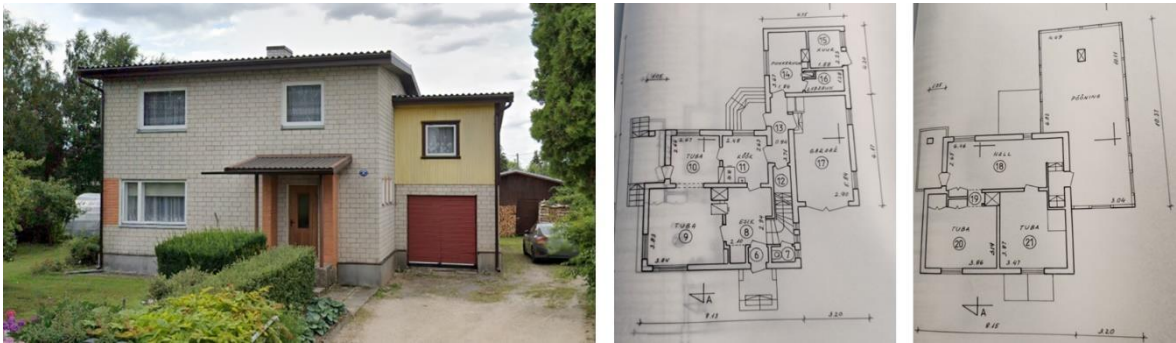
Rahumäe 8a (1964), an example of a 1960's box house with taller auxiliary wing in Karksi-Nuia (left to right: view, ground floor layout, upper floor layout)
